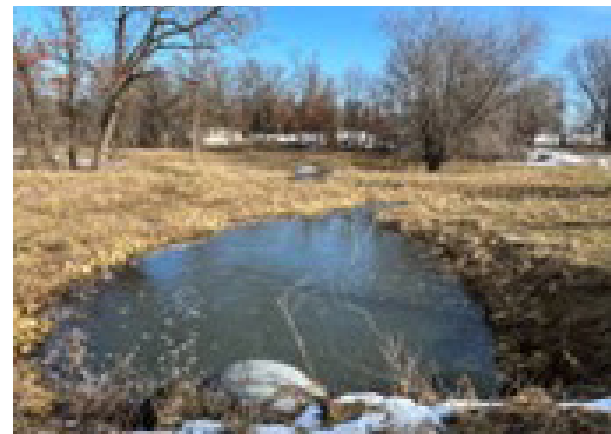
Current, February 2024, picture of the culvert under Woodhaven Drive East looking towards sections 8 & 9.
